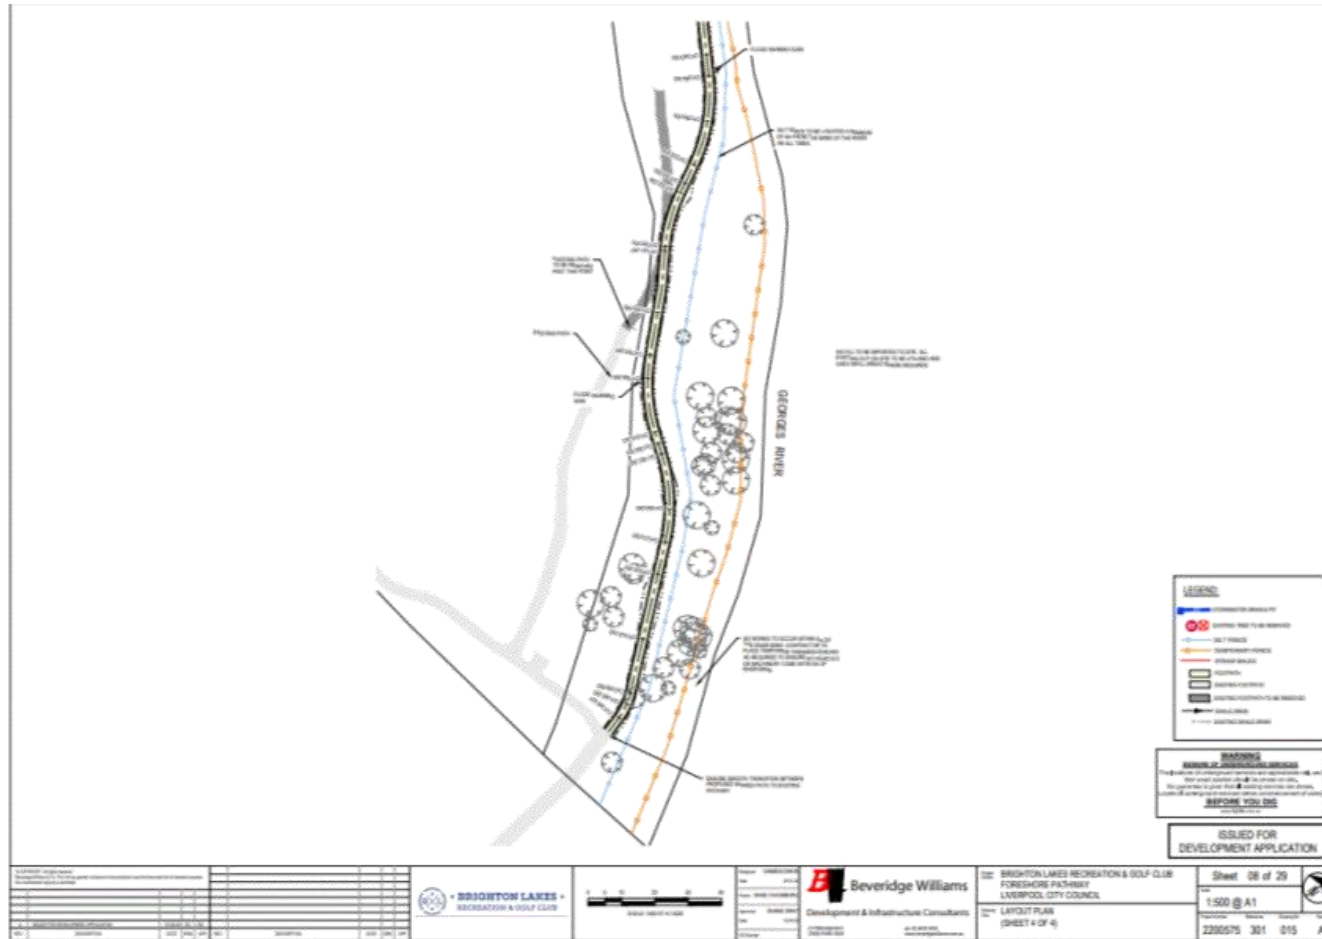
E - A schematic indication of the elements of the proposed pathway construction in the lower south-eastern section of Stage 2 (for detail see Beveridge Williams layout plans 2024)
